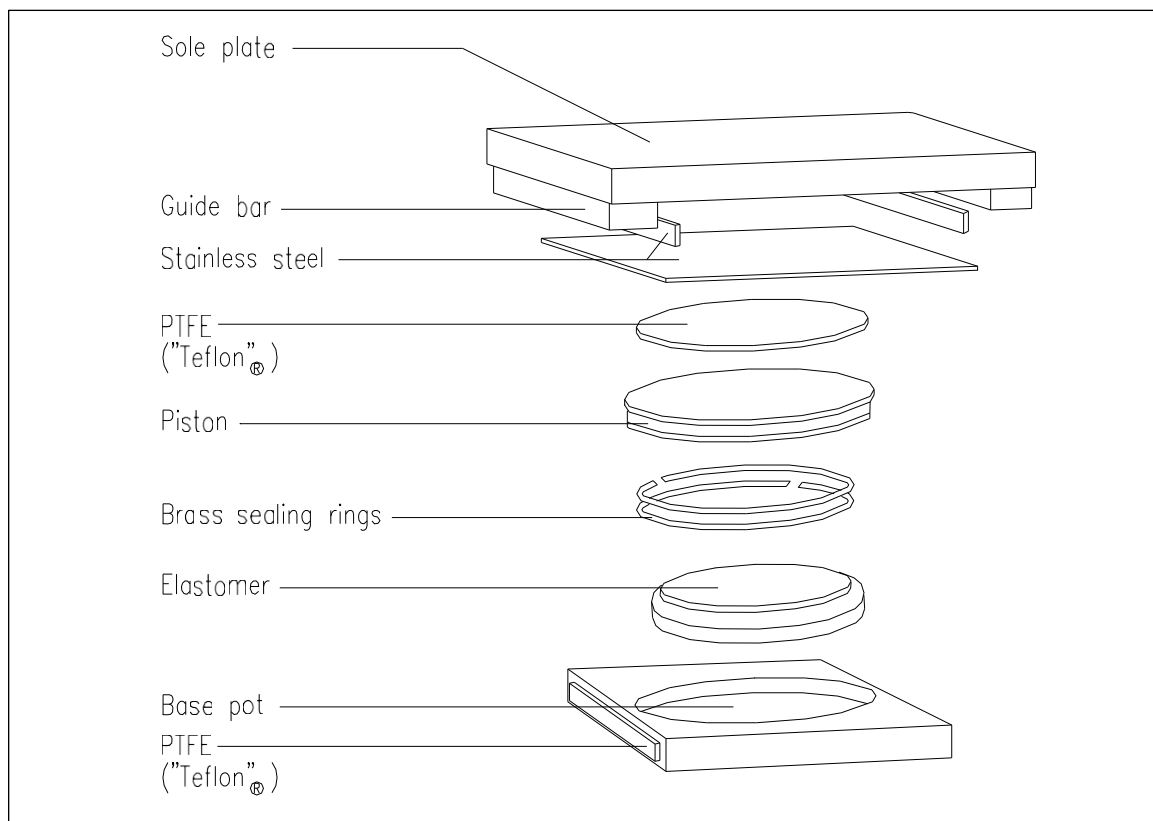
Typical Guided Pot Bearing Components
